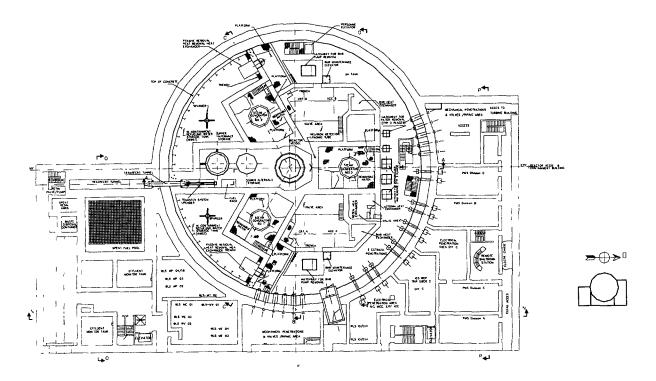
Nuclear island arrangement; plan view at operating floor elevation
